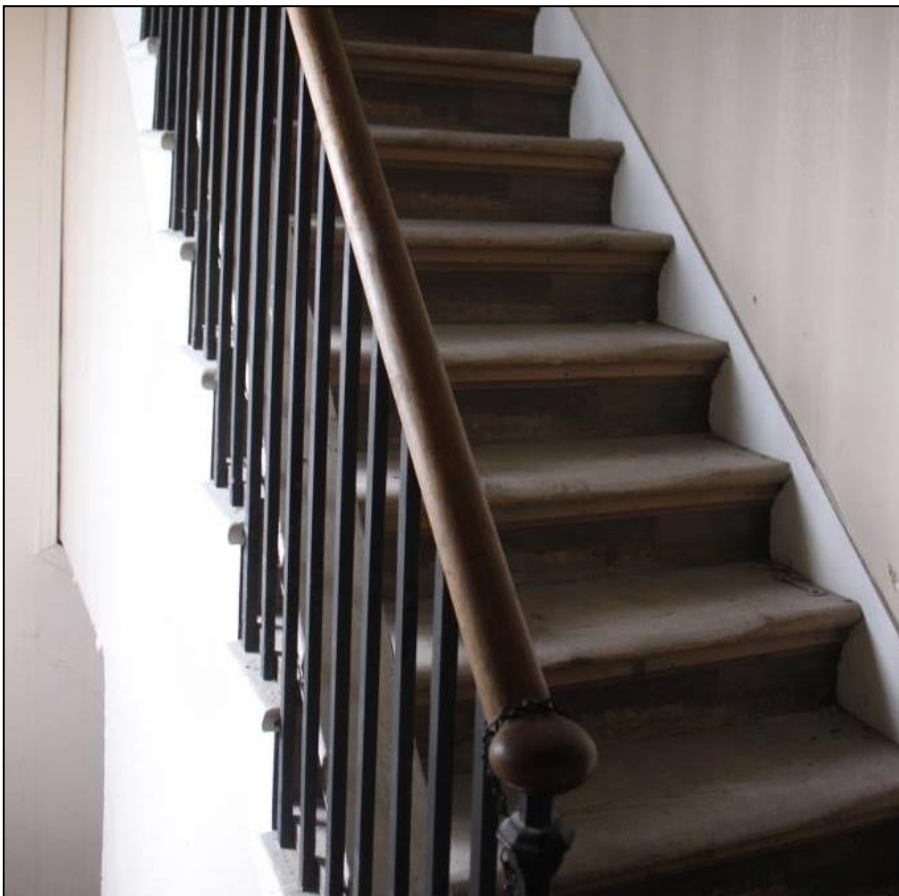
Staircase from the 1st to 2nd Floor, 14-18 Swan St. From the SSE
